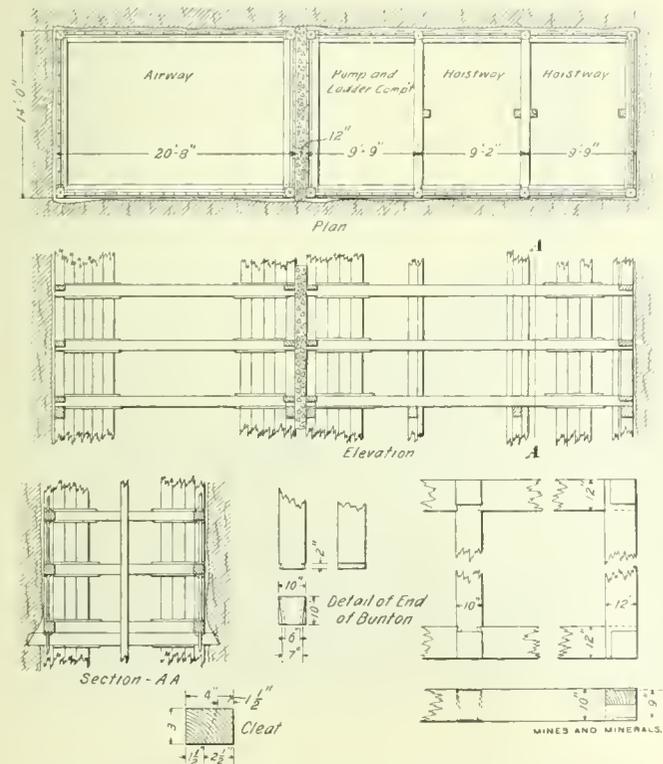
PLAN AND DETAILS OF TIMBERING, LOOMIS SHAFT
